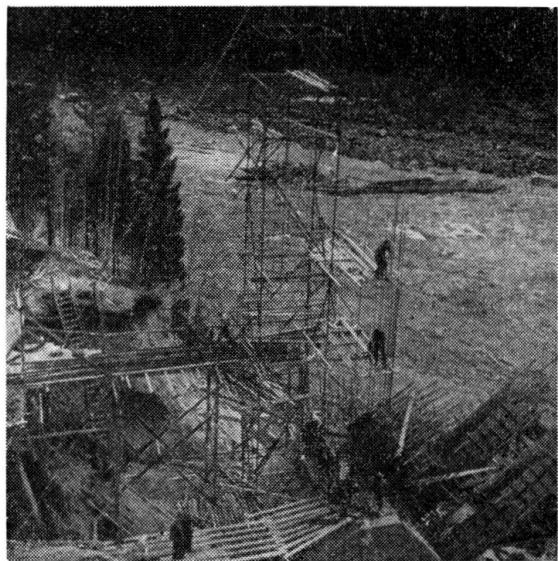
Auxiliary steel tubular scaffolding at an abutment column. The assembly of the sliding form is in progress
